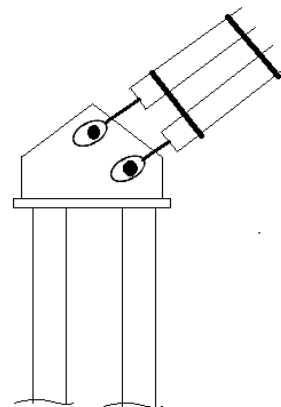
Joint connection with I-bolt joint and gusset plate
